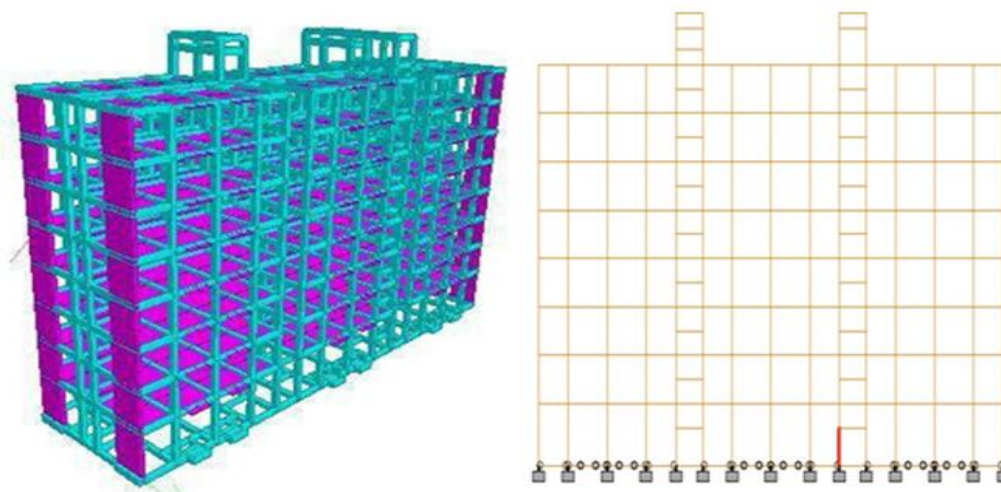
Three-dimensional view of modelled building and elevation view showing the exterior critical column of the modelled building.
